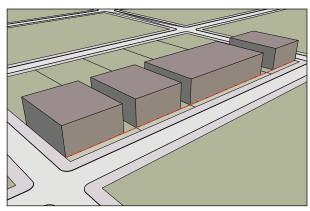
Build-to line. The Building frontage must be placed on the build-to line.
